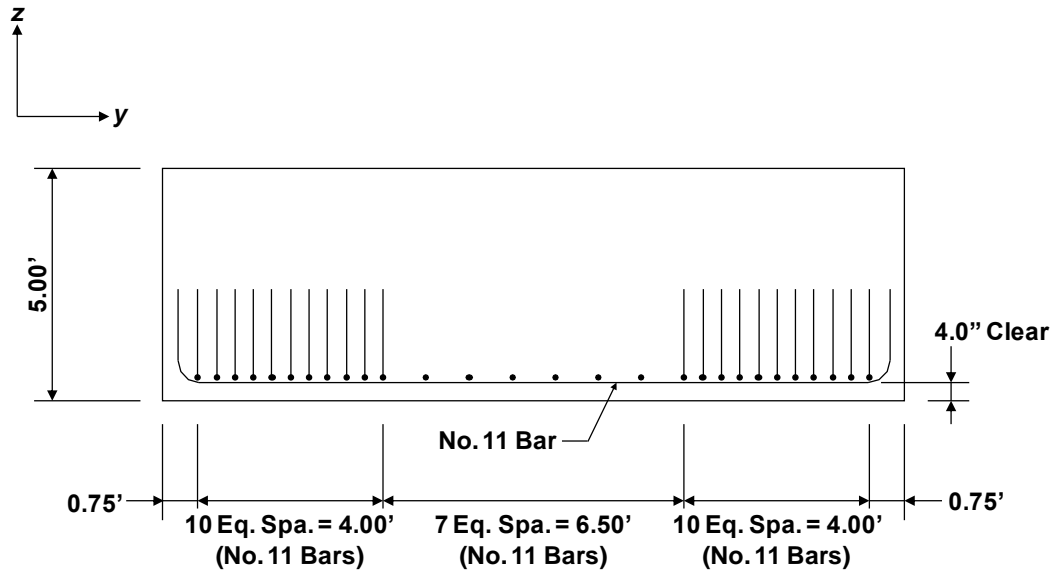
Reinforcement details – Section A-A (main reinforcement)
